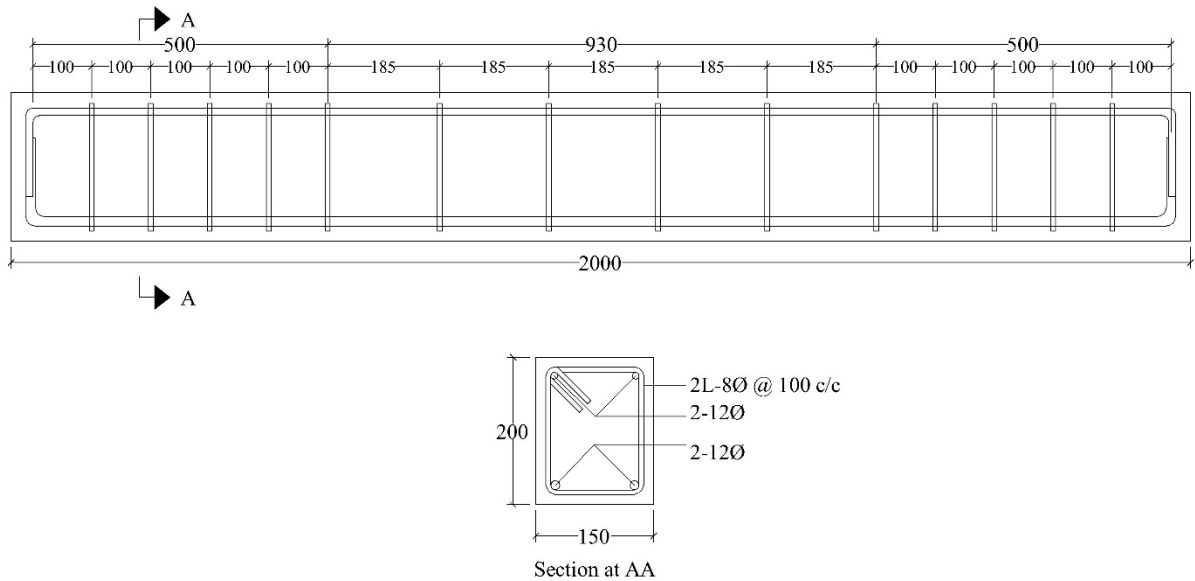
Details of controlled and repaired RC beams (*All dimensions are in mm*).
